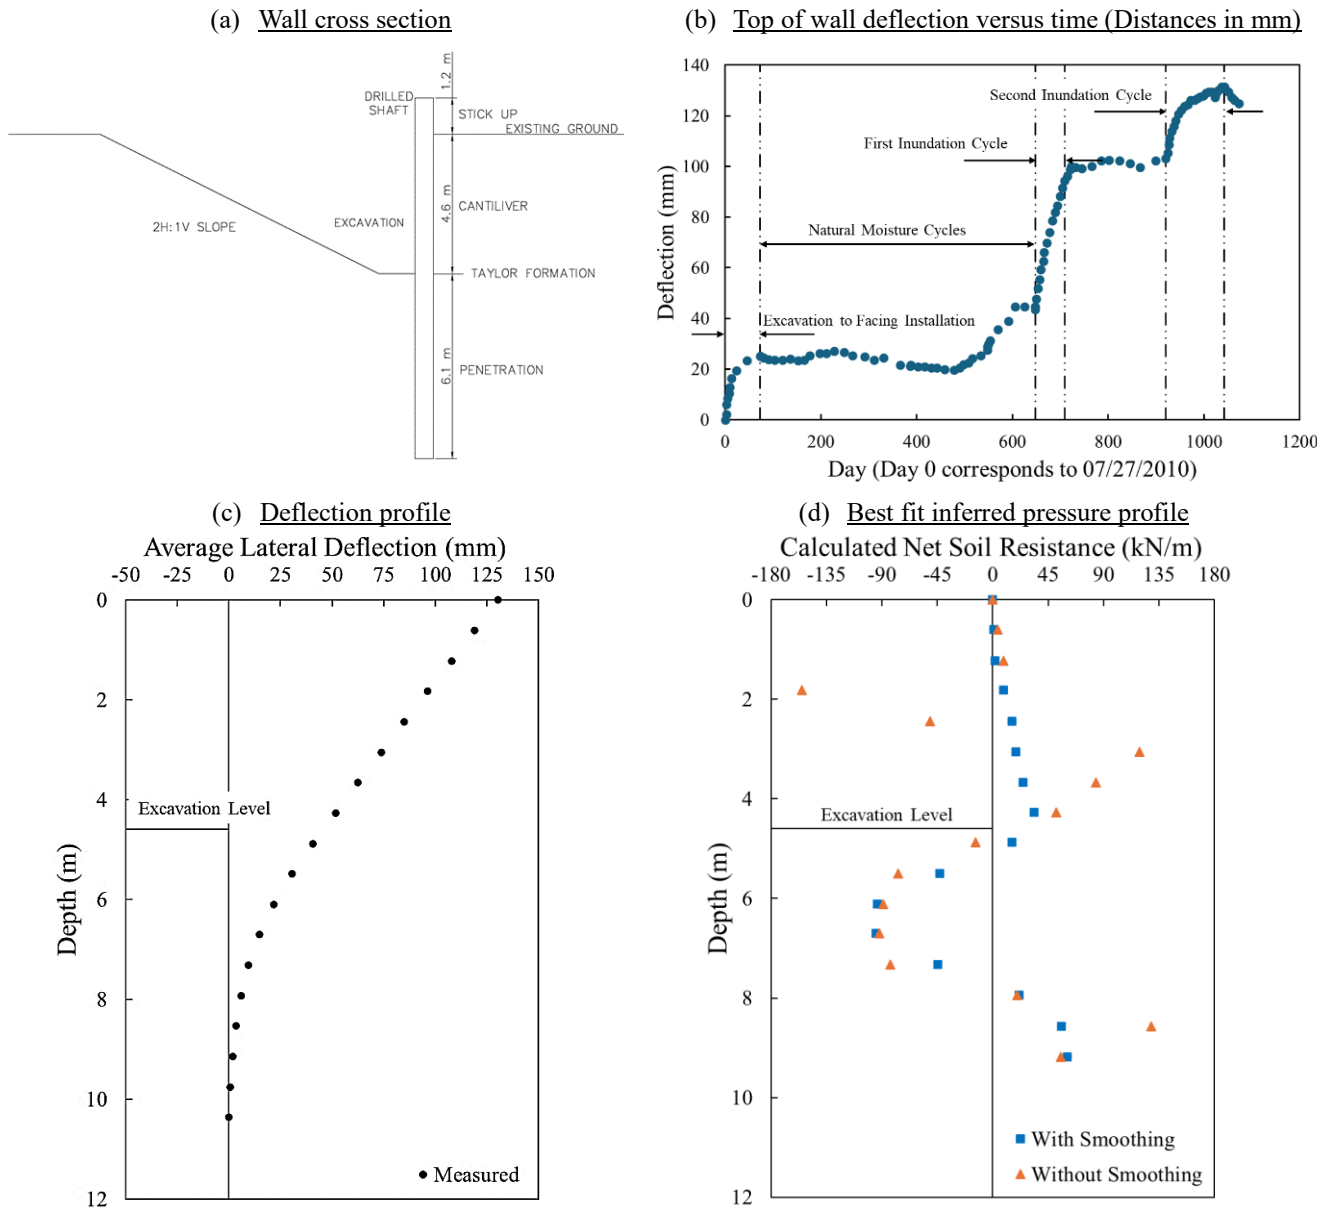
Measured pressure distribution for Brown (2013) wall: (a) wall cross section, (b) top of wall deflection versus time, (c) Deflection profile, (d) best fit inferred pressure profile (after Brown, 2013).
